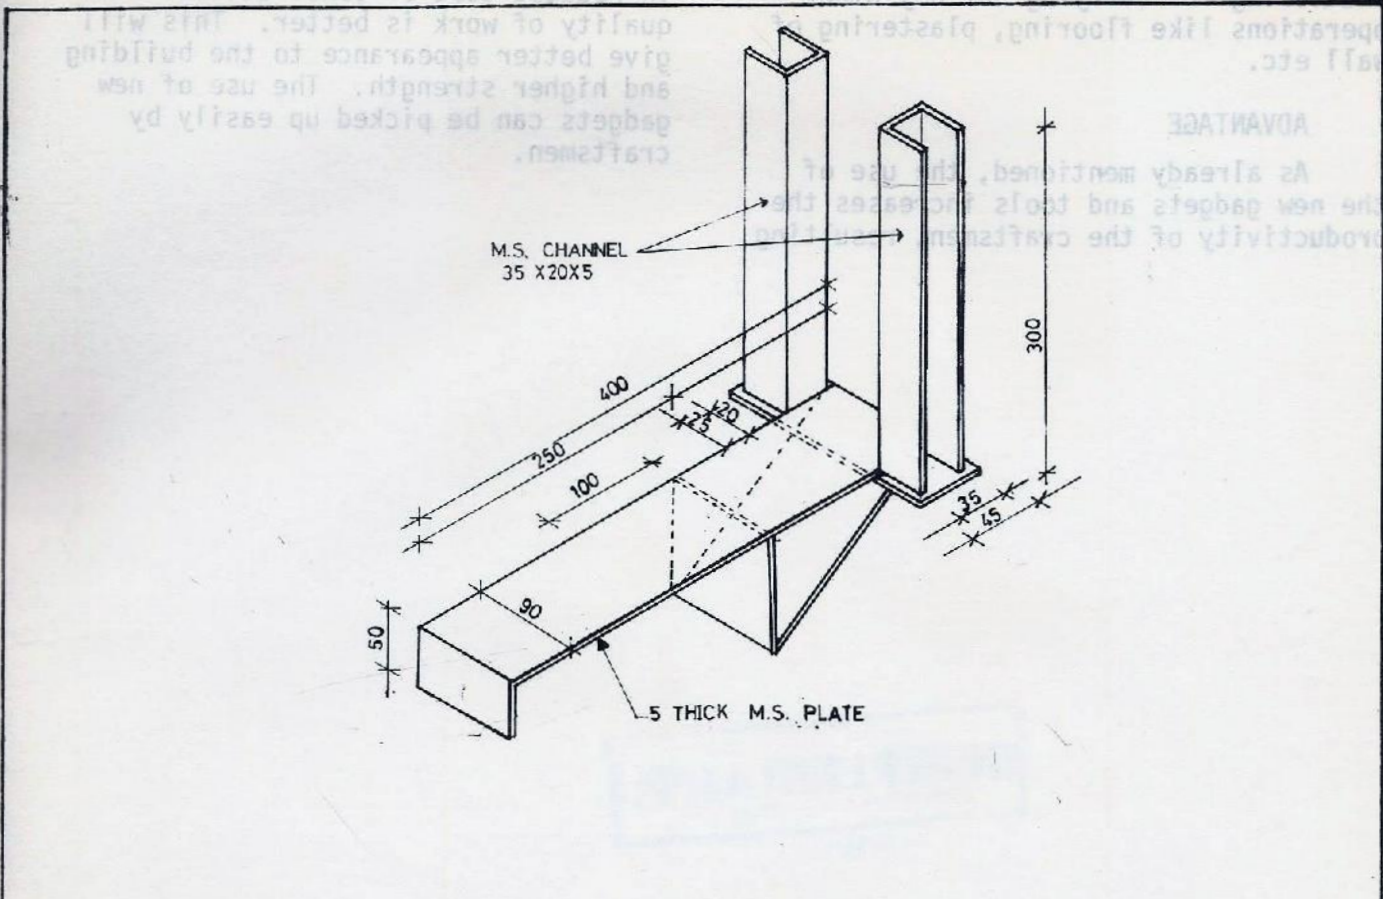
WALL BRACKET FOR SLAB FORMWORK.
